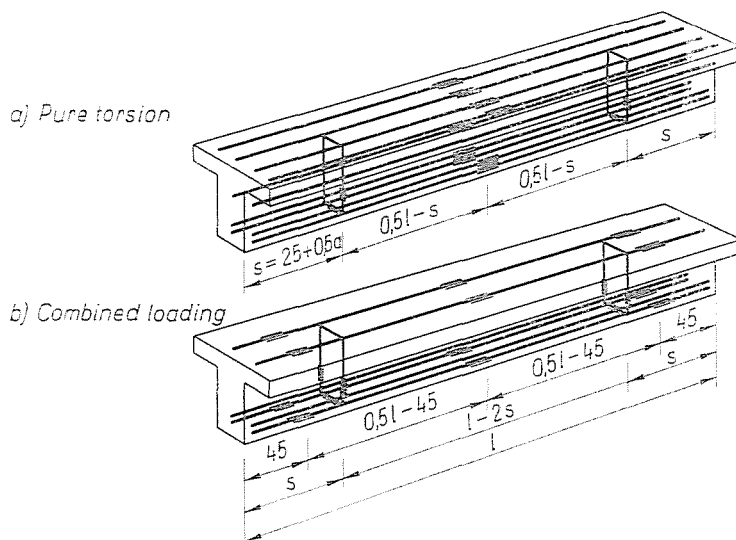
Arrangement of strain gauges on the reinforcement bars
